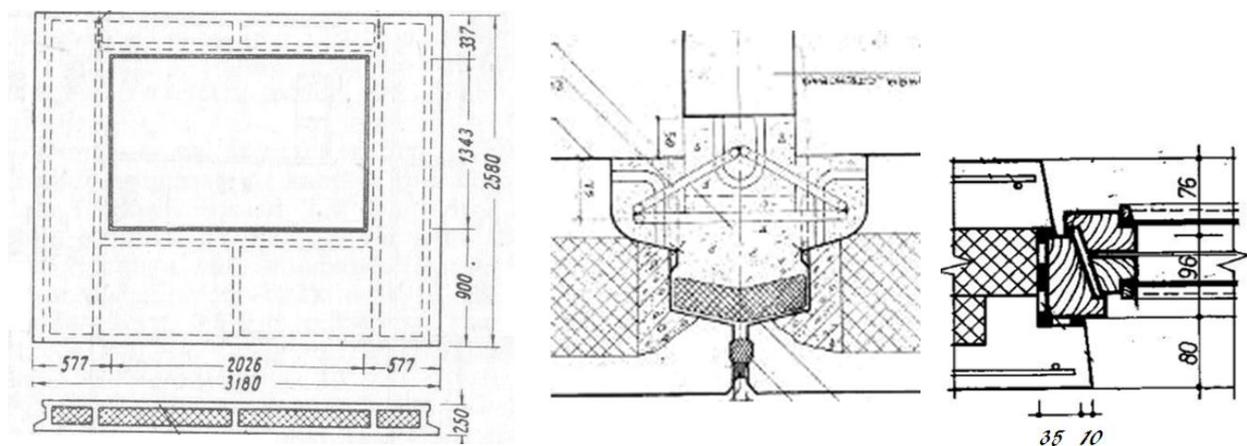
Original design drawings and junctions of a case study building – external wall concrete element (left), junction of external wall/ internal wall (middle) and junction of external wall/ window (right).
